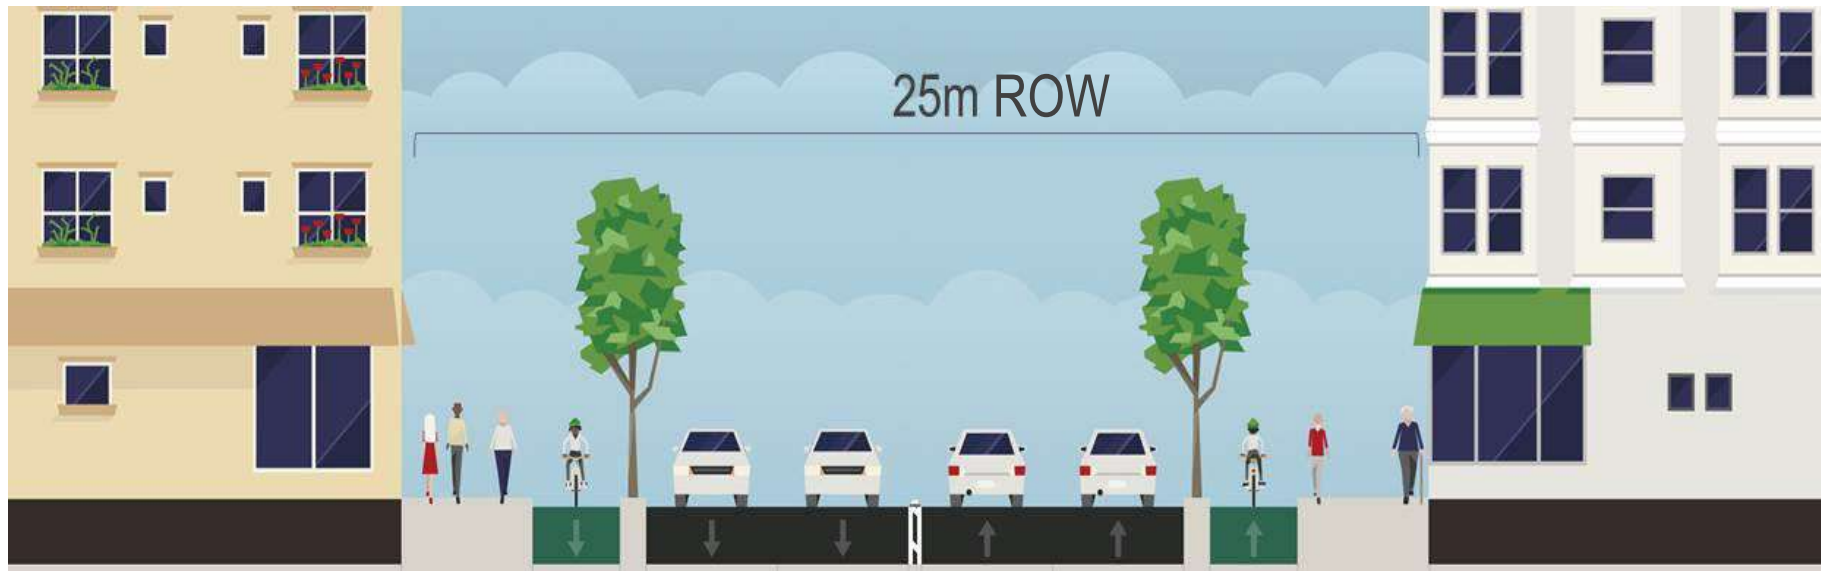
Richmond Road street cross-section (SURP, 2019)
